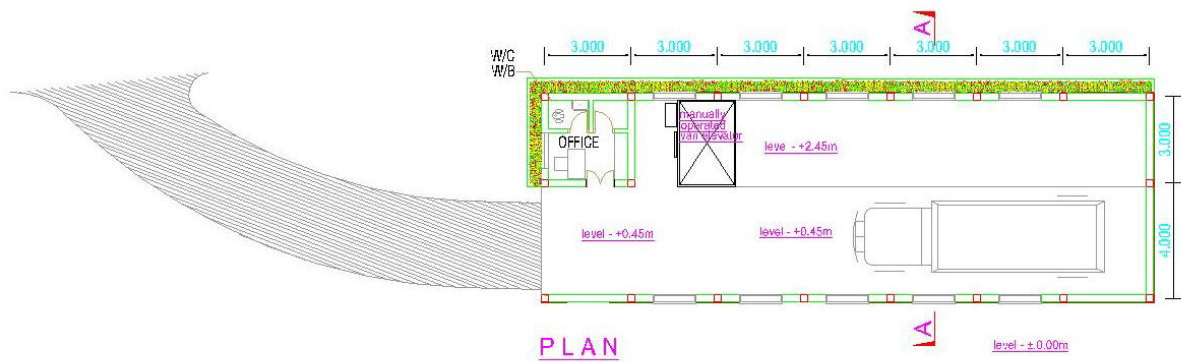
STS – 3 Terokhadia Women Sports Complex Layout Plan (24°22'51"N, 88°35'16"E)
